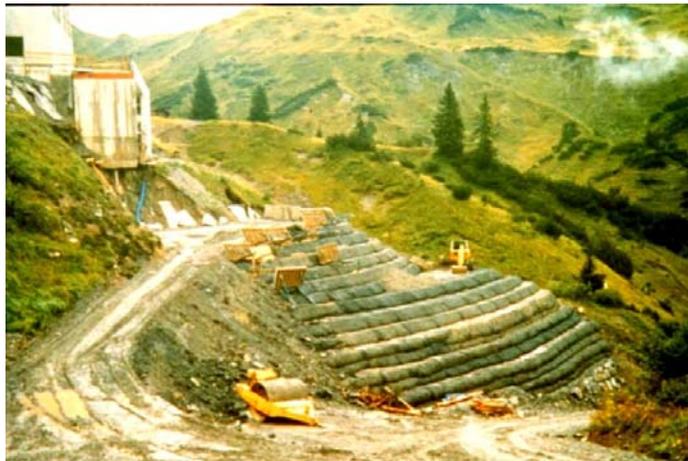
Steinmaderer Wand: construction stage of stabilizing reinforced slope (1994)
